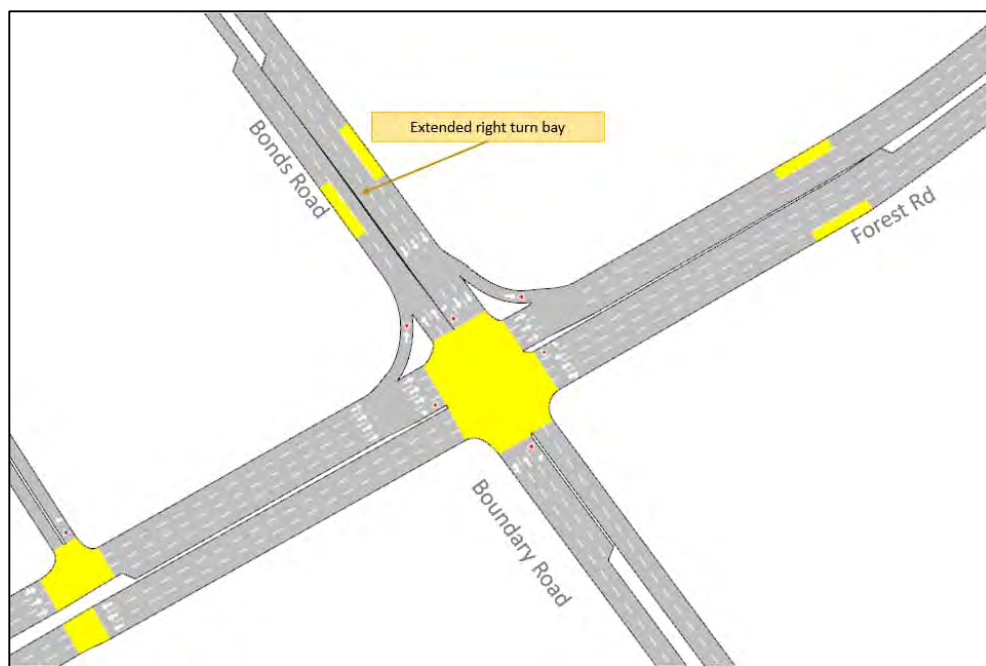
Bonds Road/Forest Road/Boundary Road (2041)
